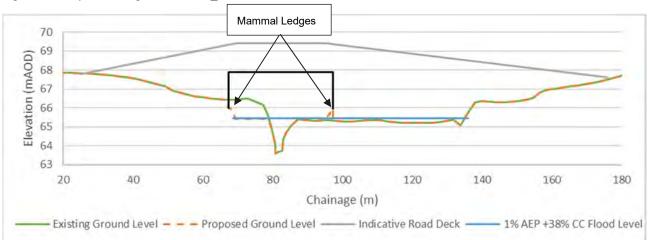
Proposed bridge at ESTO01\_17135BU
